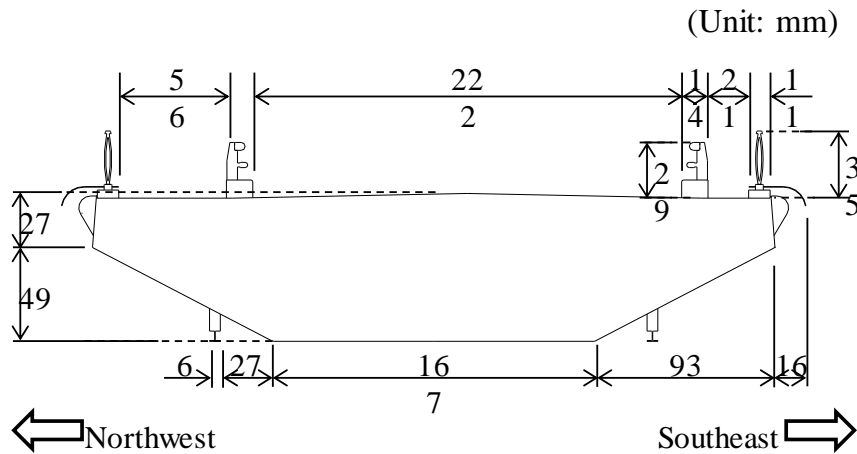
Deck Section Shape of the 2nd Jindo Bridge
